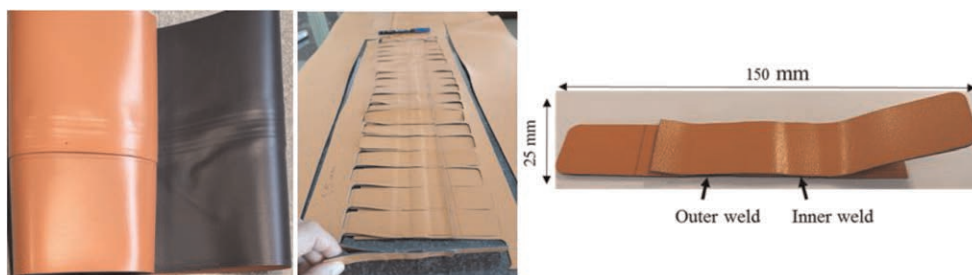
Dual-track geomembrane seam sample and seam specimen.
